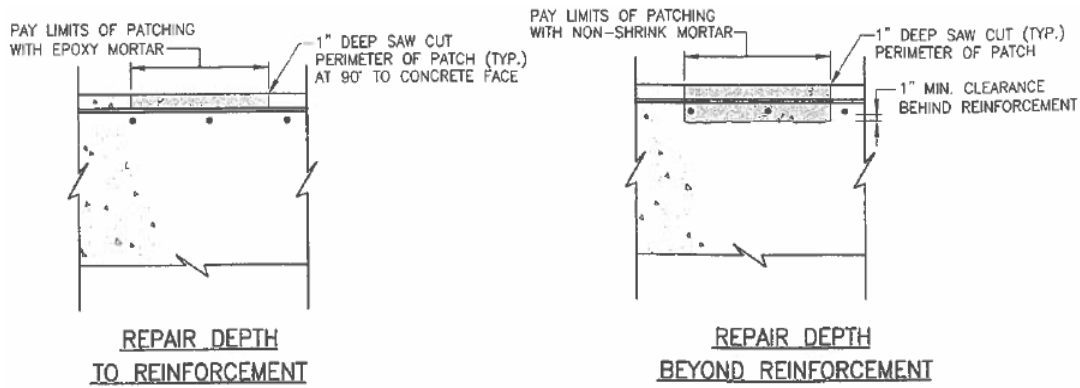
Repair of concrete cavity (Seniwongse 2007).
